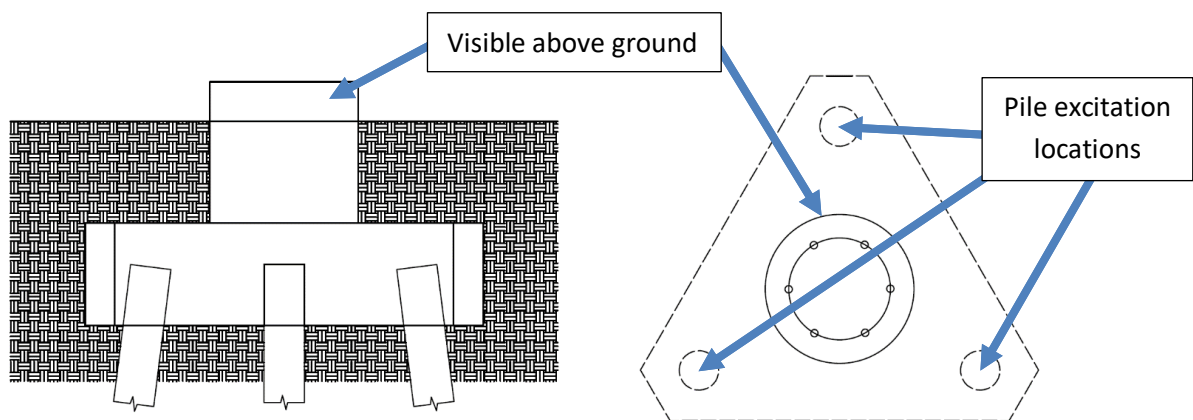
Cross-section view (left) and plan view (right) of in-ground pile cap.
